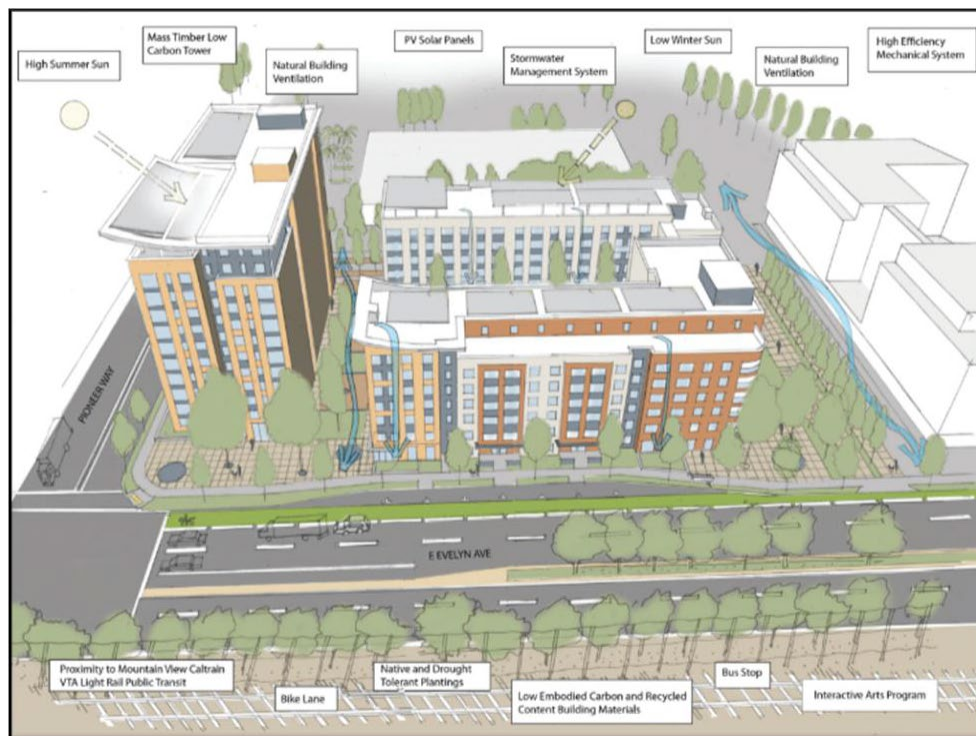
Affirmed Housing Proposal—Design and Sustainability Plan
